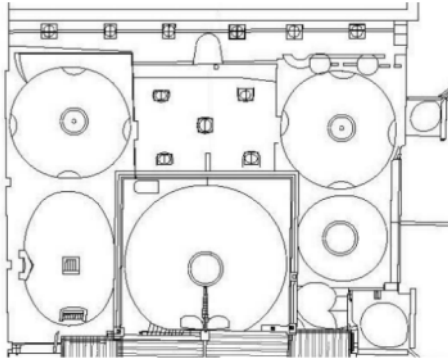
Quito, Catedral Metropolitana, detail of roof plan, presbytery, ambulatory and side chapels domes (IMP 1989b).
